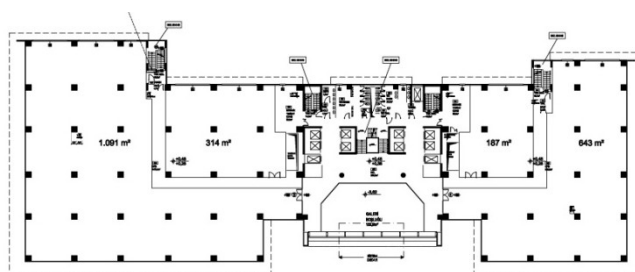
AKPLAZA, Ground floor plan⁶³
